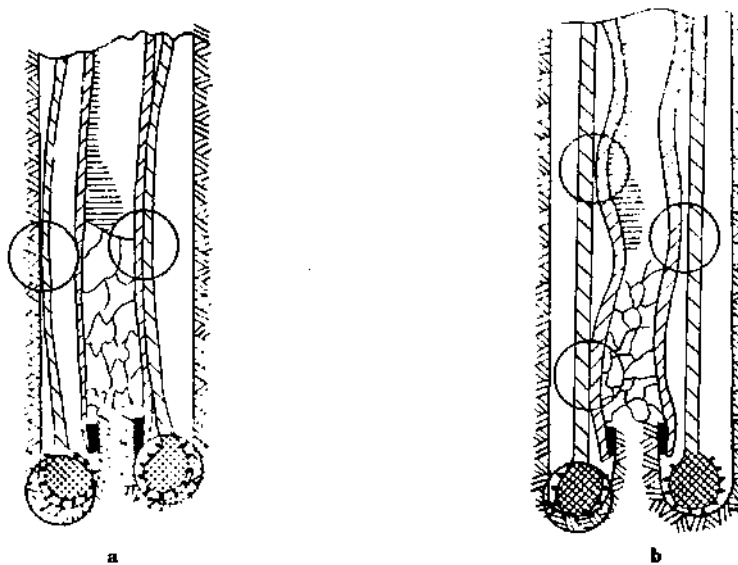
Damage caused by excessive pressure in diamond drilling
